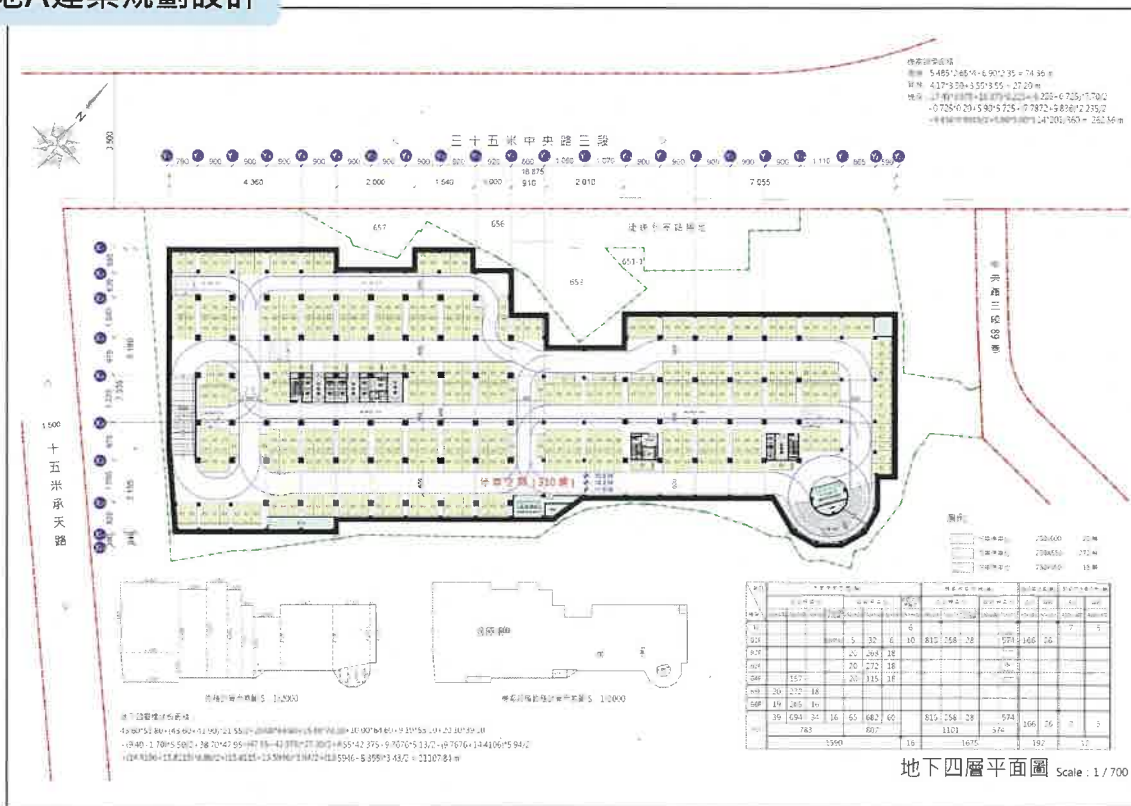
Ground floor plan of the building. The plan shows a large rectangular building with a central courtyard and a circular feature on the right side. A north arrow is located in the top left corner. A scale bar at the bottom indicates 1:700. The drawing includes various dimensions and labels for different areas and rooms.
